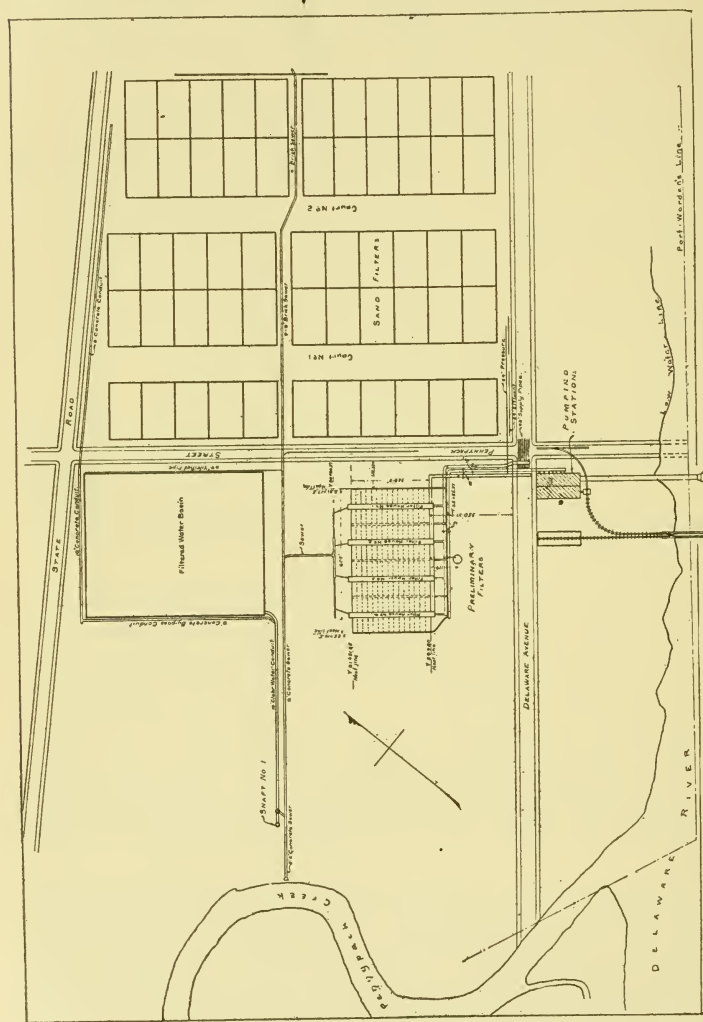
PLAN OF TORRESDALE FILTER PLANT, SHOWING PUMPING STATION, PRELIMINARY FILTERS, 55 OF THE 65 SLOW FILTERS, FILTERED WATER BASIN, AND BEGINNING OF TORRESDALE CONDUIT.
